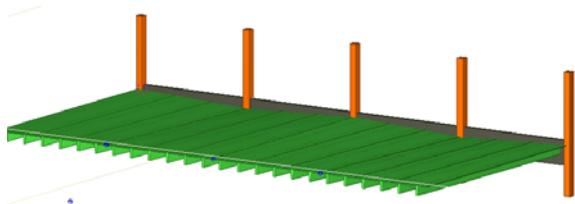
Warping of Precast Concrete Slabs (Note the depression of the slab at the second and fourth columns).
